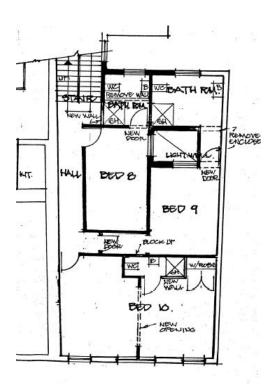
Fortune of War Hotel, 137 George Street, alterations to the second floor (front), 1989. Source: PMNSW ROX 410 DA 0019/DR & ROX 410 DA 0020/DR – details.
